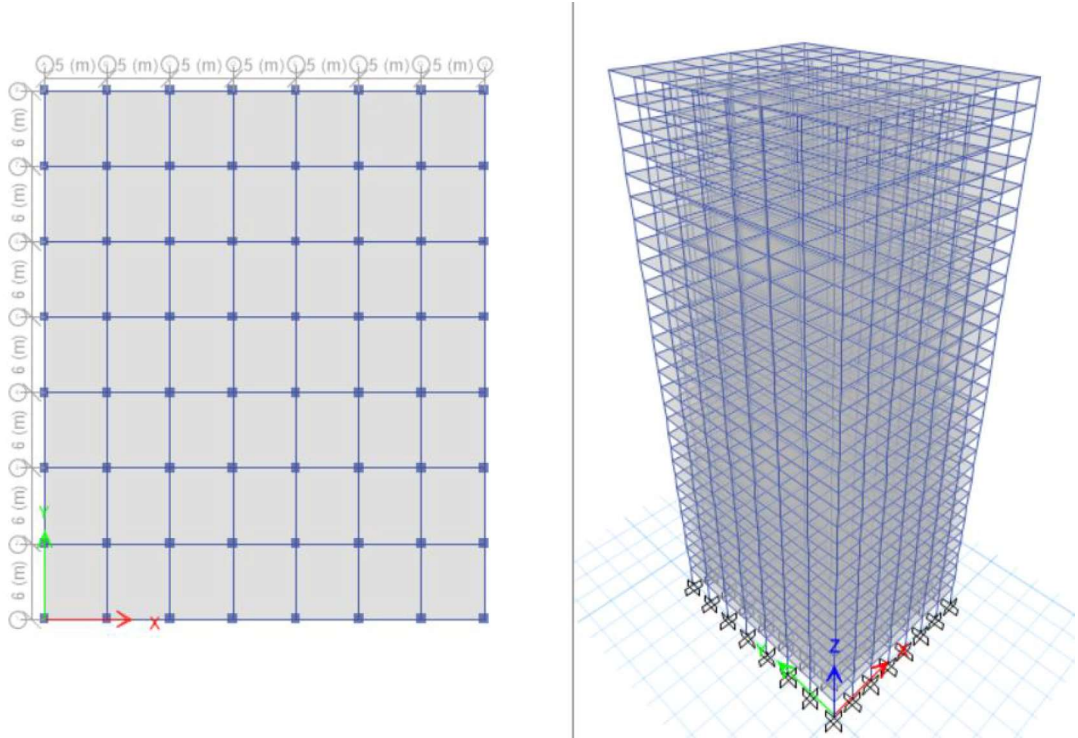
5 Structural Plan and Elevation Views of Case I Model
